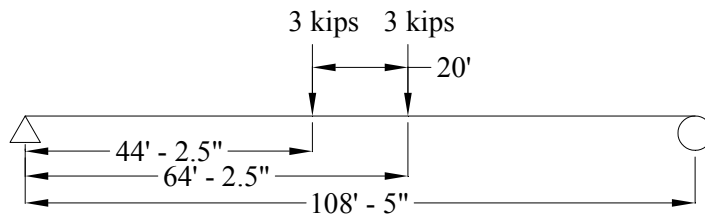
Location of Interior Diaphragms on a Simply Supported Bridge Girder.
